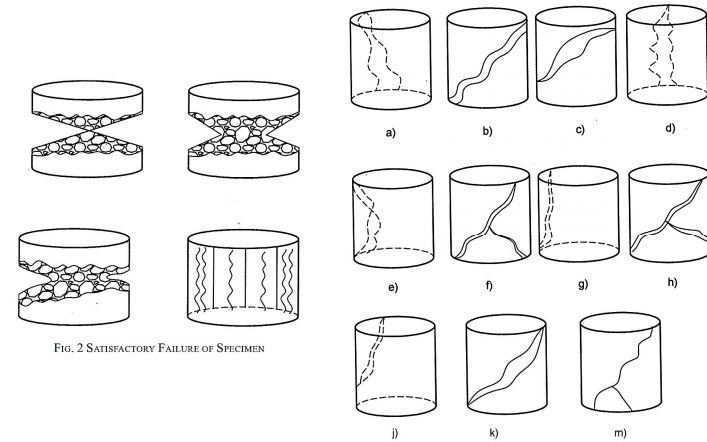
SATISFACTORY FAILURE OF SPECIMEN
